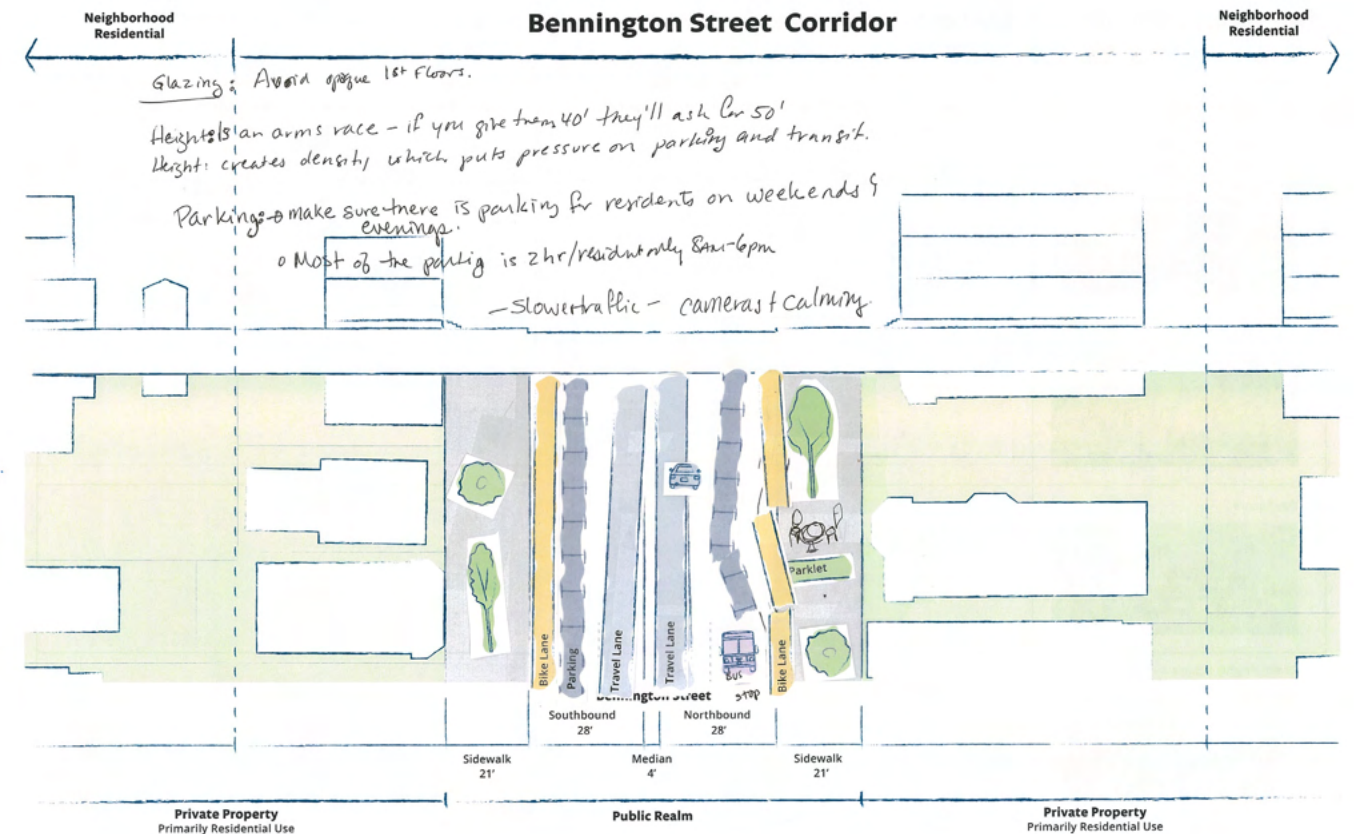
BENNINGTON STREET CORRIDOR WORKSHOP EXAMPLE [ABOVE]
